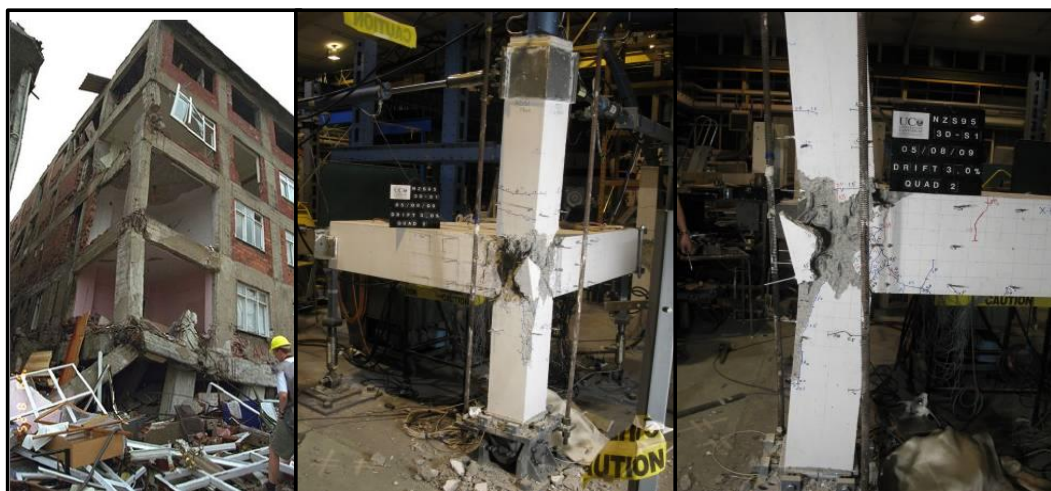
Left: Collapsed RC frame building during the 1999 Kocaeli earthquake; right: corner beam-column joint slab specimen tested at the University of Canterbury (August, 2009).
